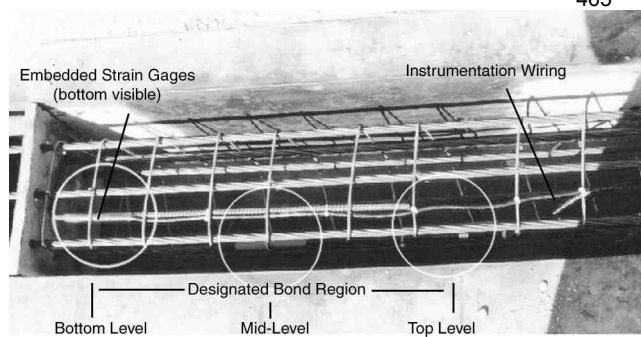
Prestressing bed for casting 36 cm instrumented piles.
